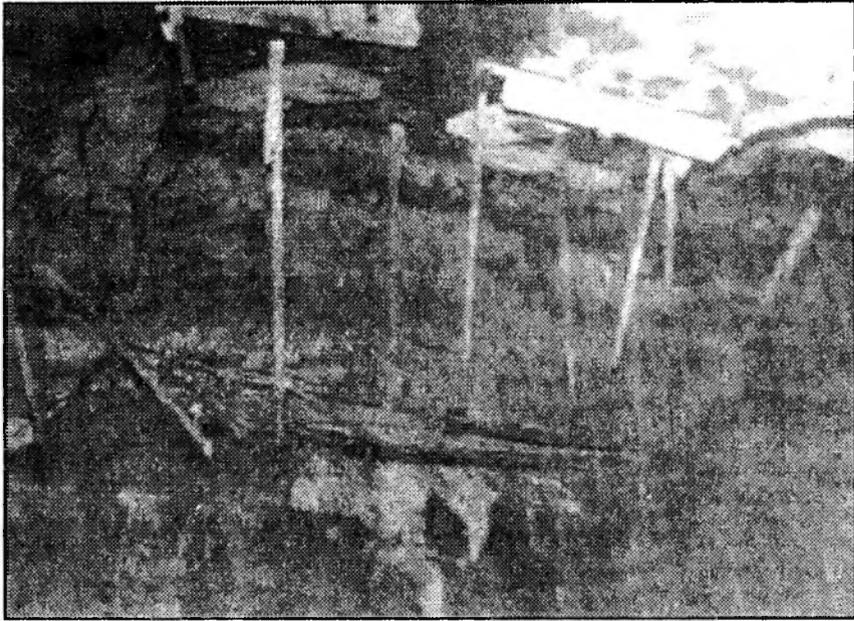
"Kink Zone", the causative factor of failure of coal roof and resulting the roof bolts as ineffective.
